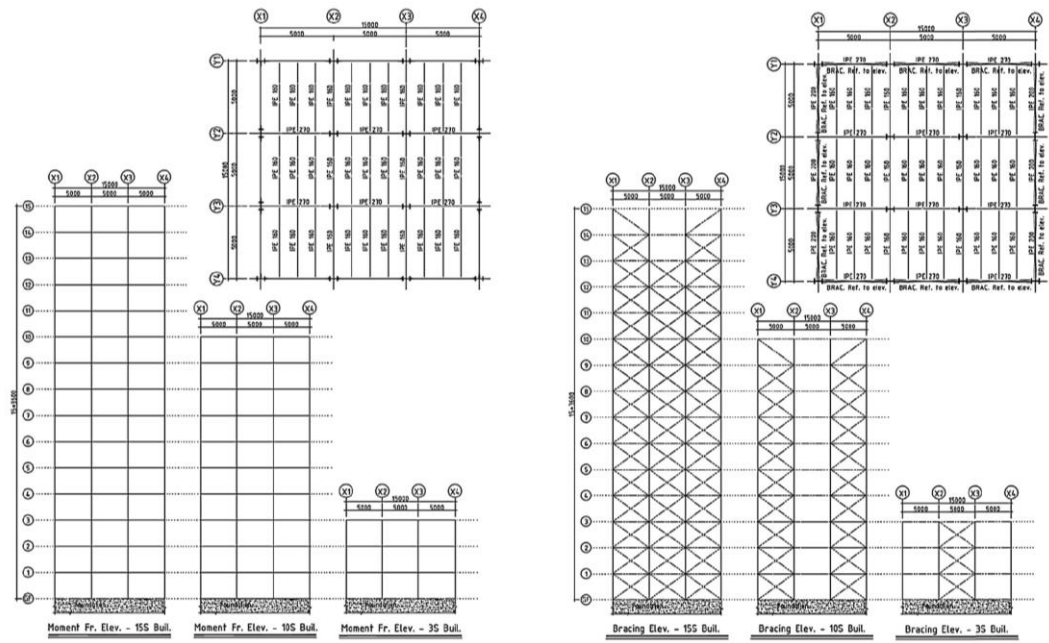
Steel Moment Resisting Frame (Left) and Braced Frame (Right) Structure Models
